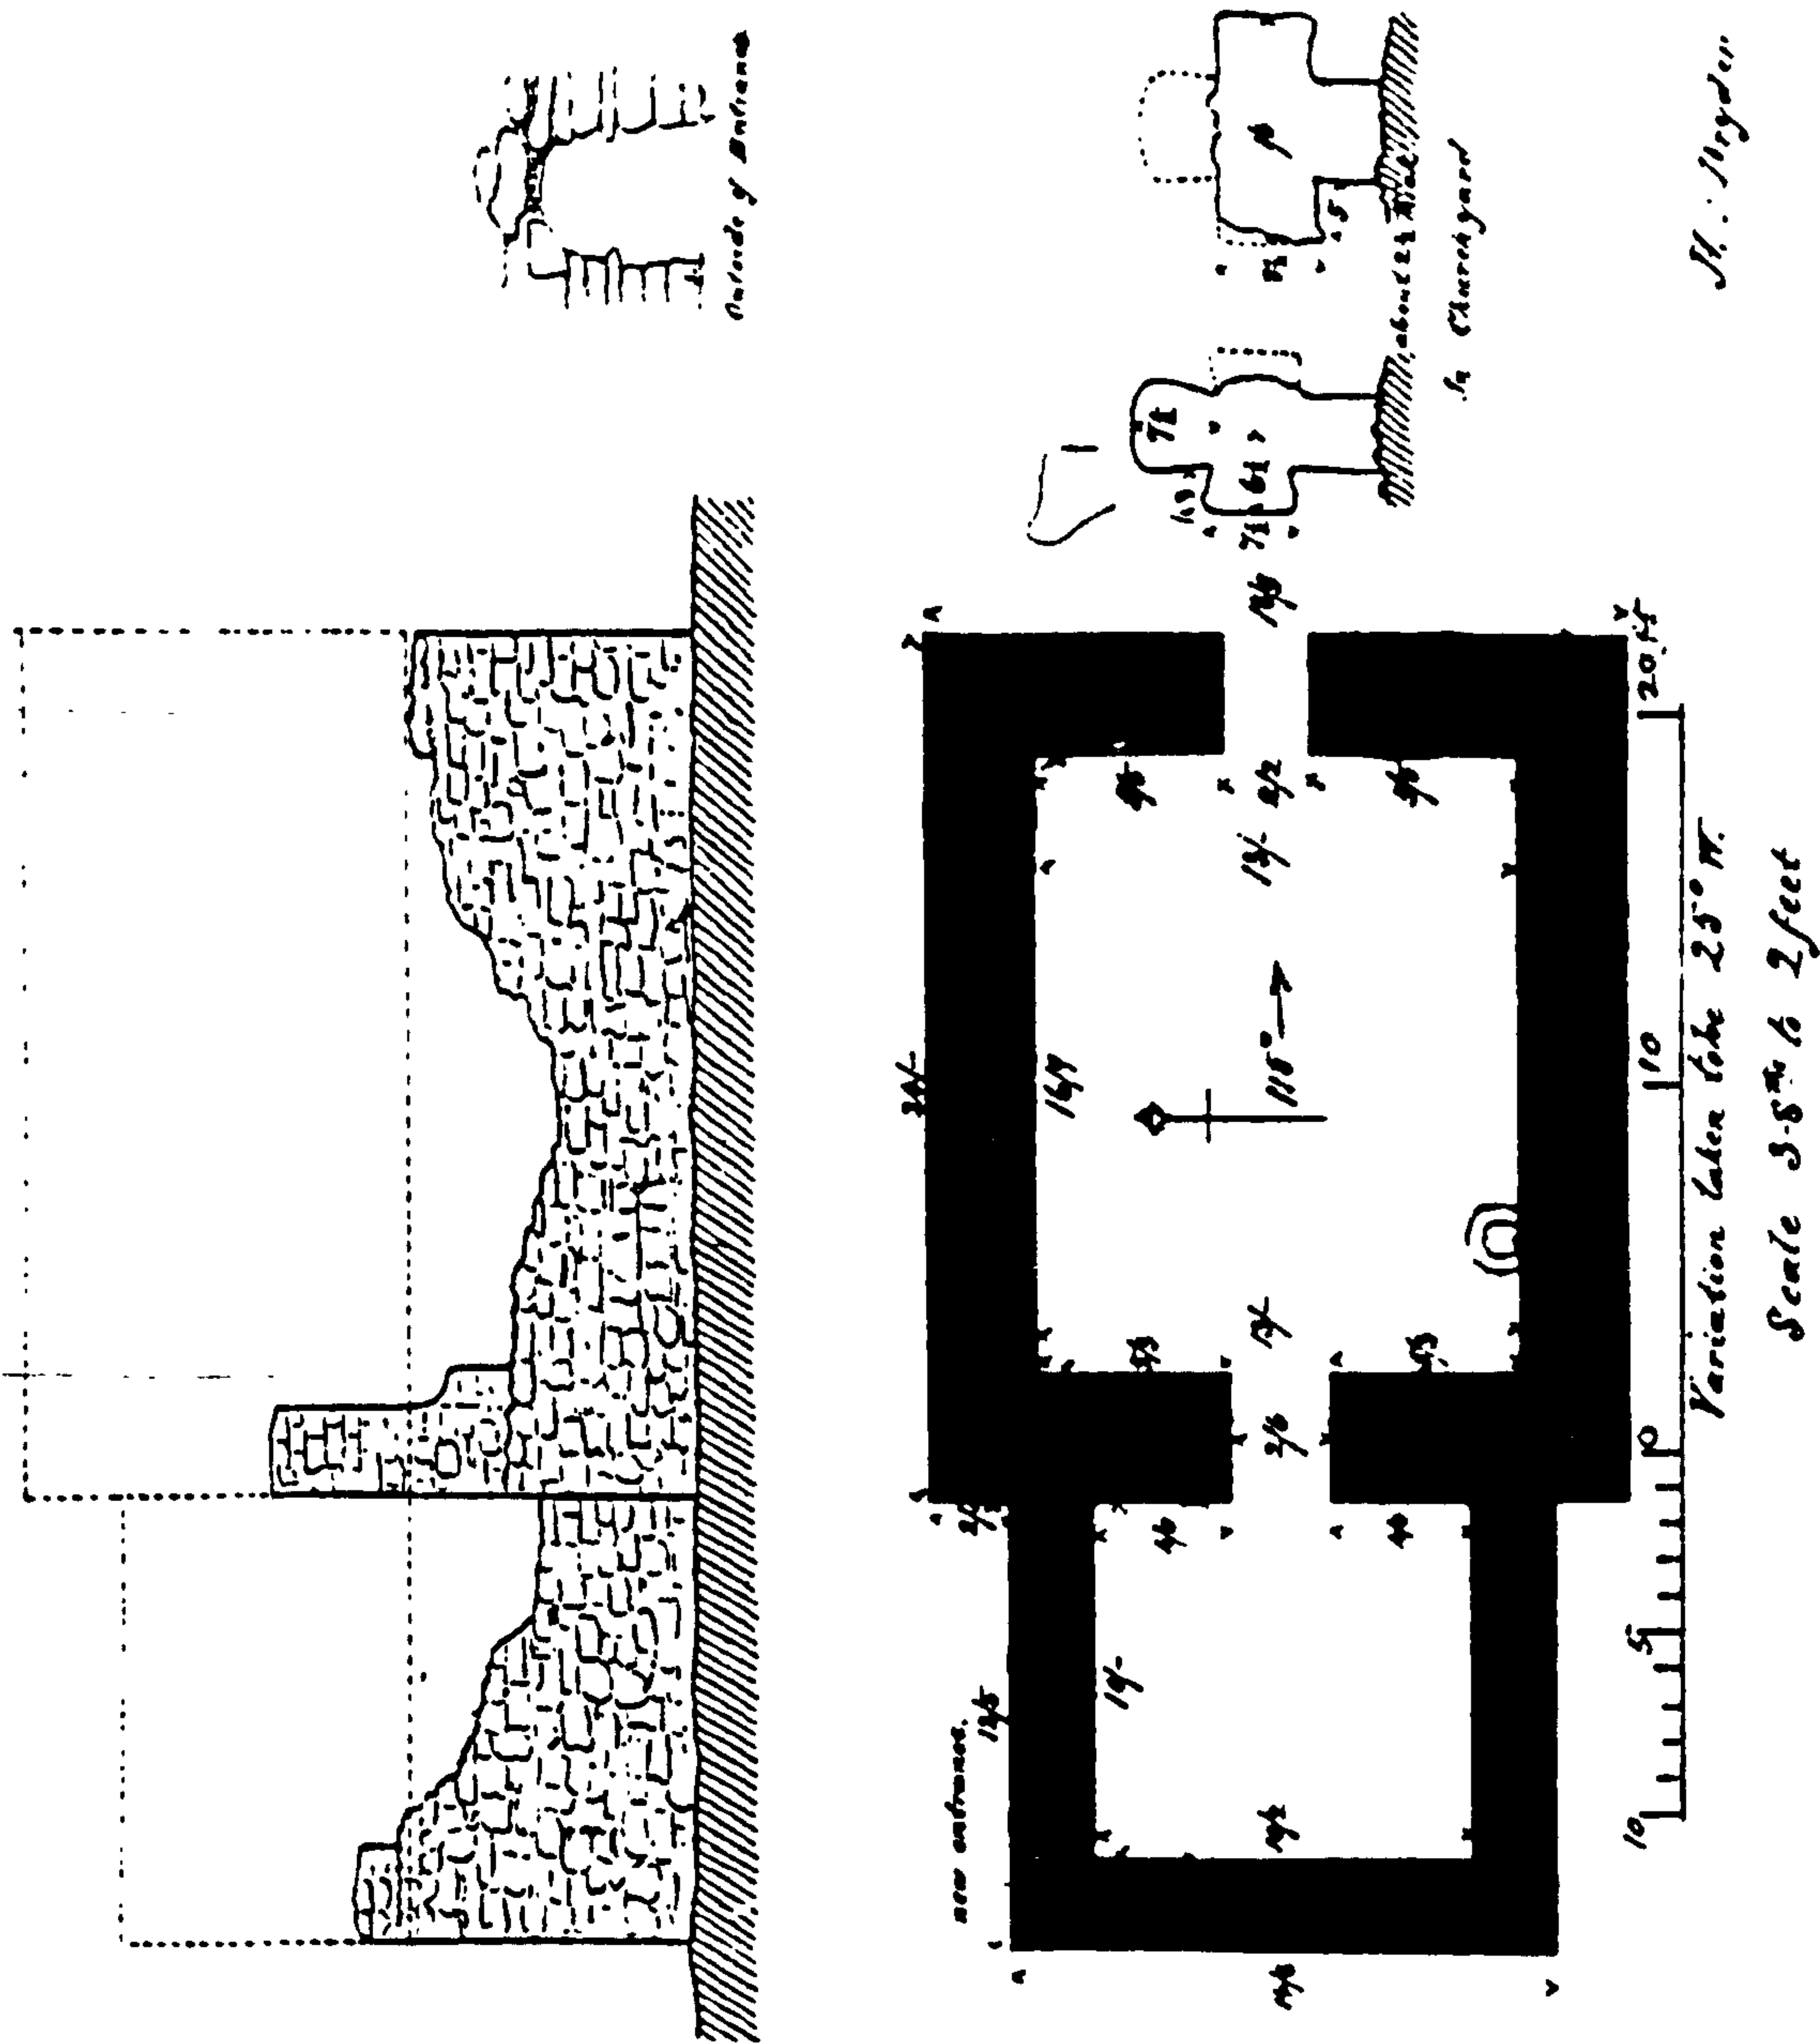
Church at Uyea. Plan, South Elevation, &c.
